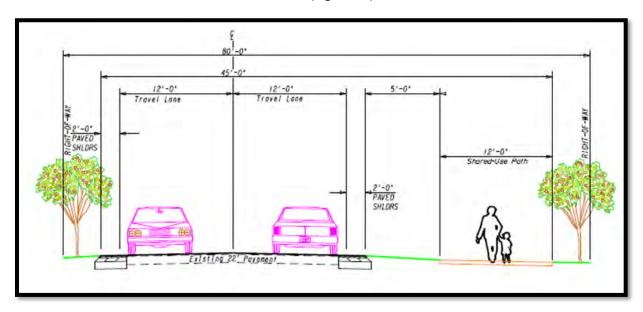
Proposed Typical Section – Alternative 1 & 2 – 20<sup>th</sup> Ave. to Entrance 1 & 2
